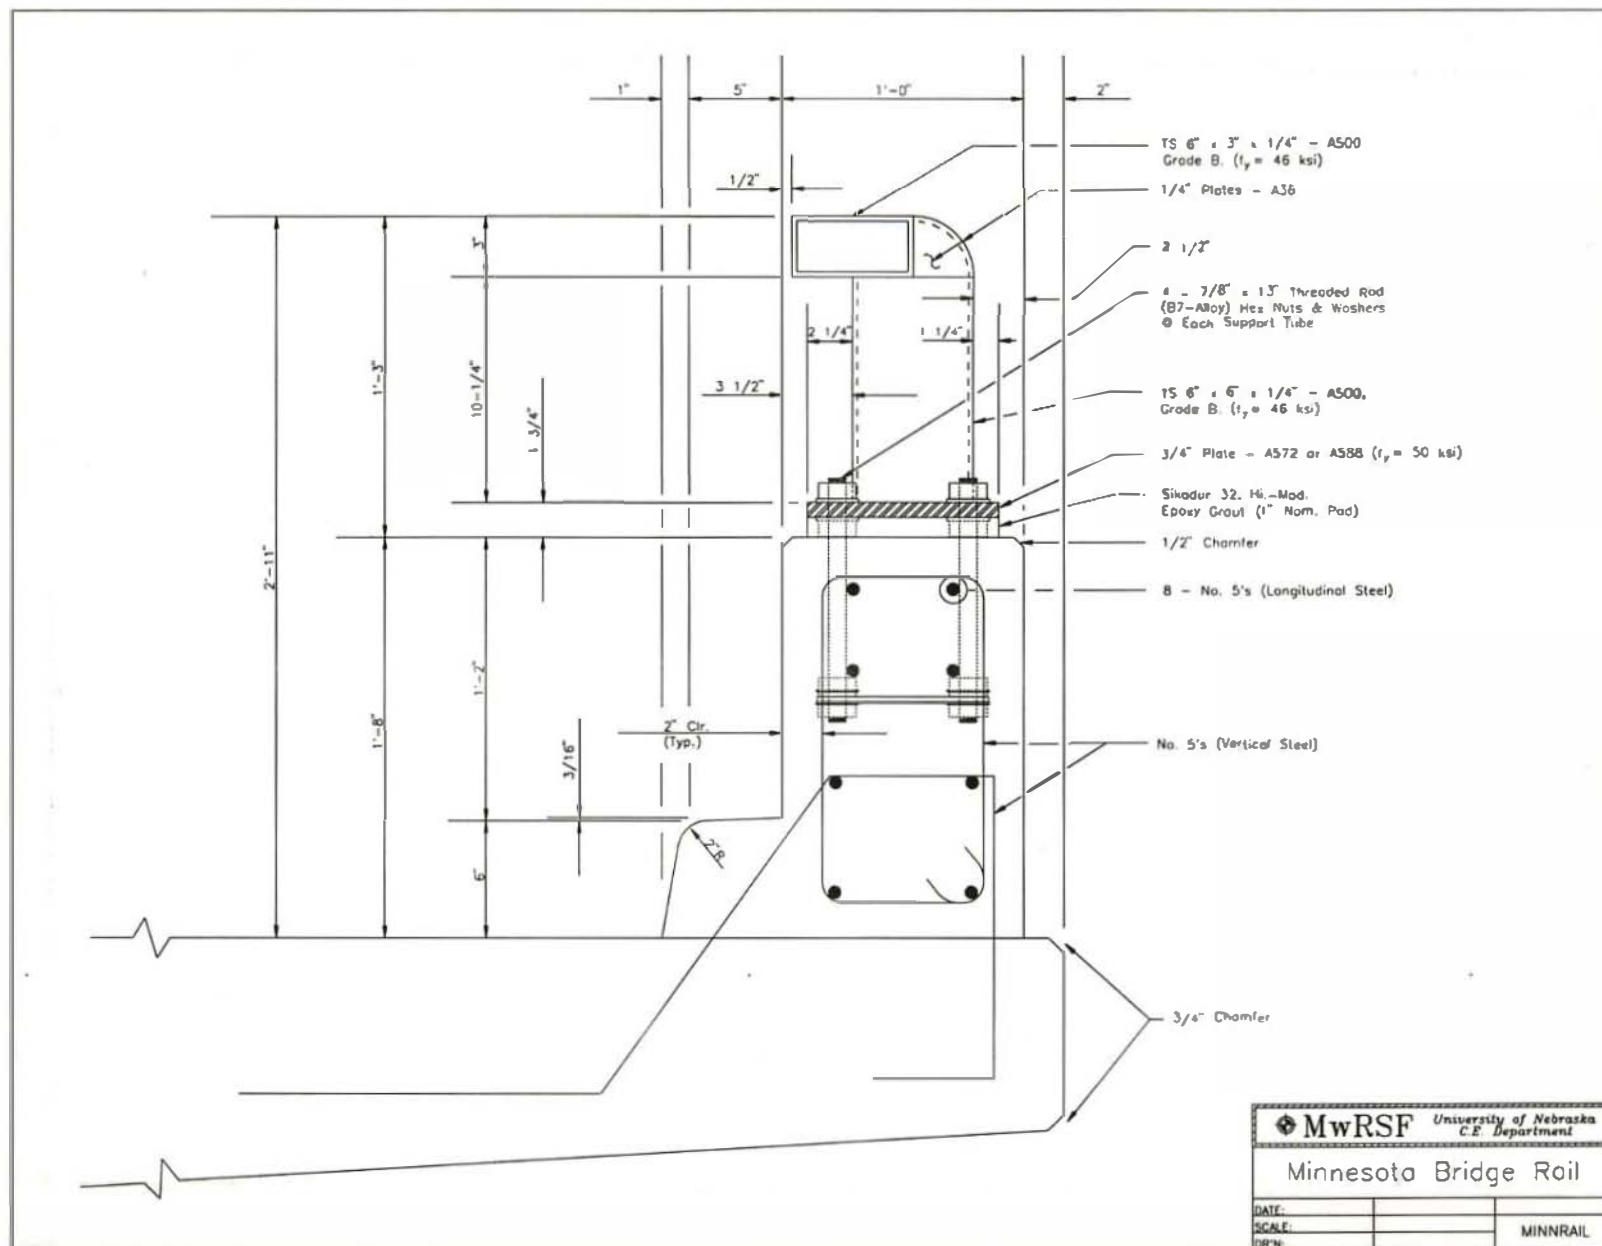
Minnesota Combination Bridge Rail Design Details, Design No. 1.
